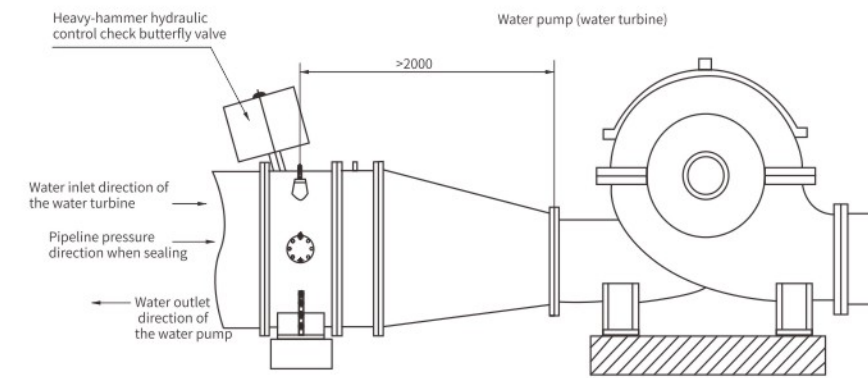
Heavy-hammer hydraulic control check butterfly valve (reverse installation)
